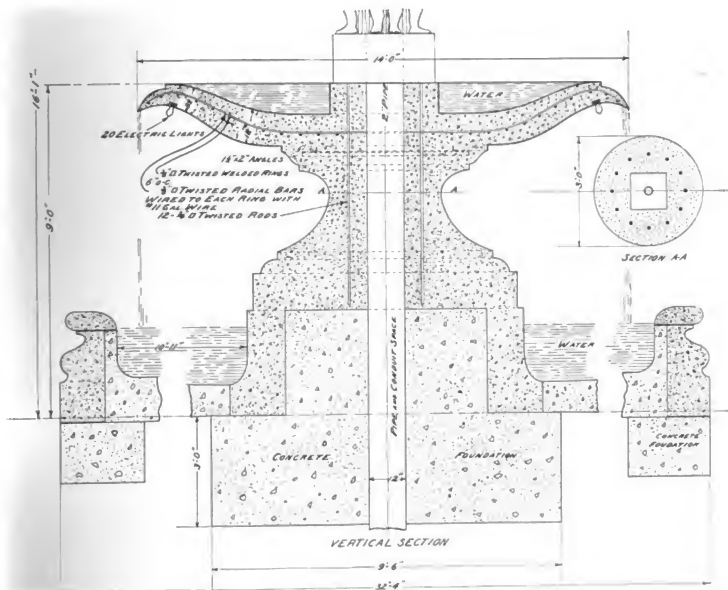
SECTION OF CONCRETE FOUNTAIN AT LOS ANGELES, SHOWING DETAILS OF CONSTRUCTION.
